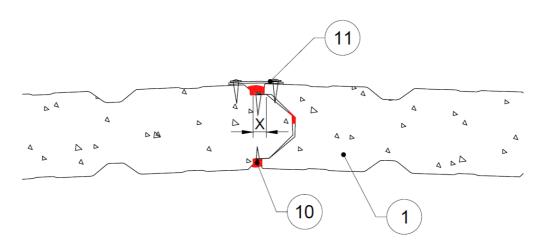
Panel Joint Sealant Detail for Walls with Radius
